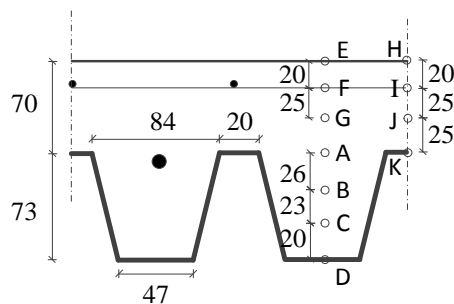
Geometry of TNO tested slab (Hamerlinck et al. 1990) (dimensions in mm)
